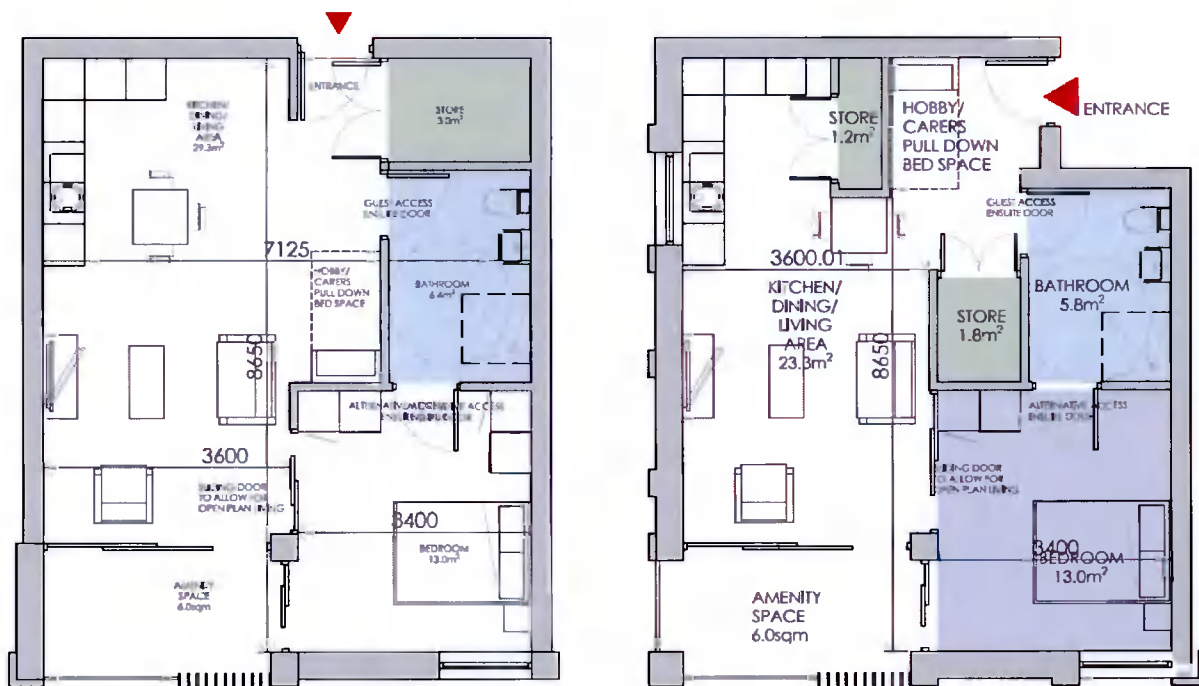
Typical first floor plan of the independent living blocks House Type 5 (left) and 6 (right).
